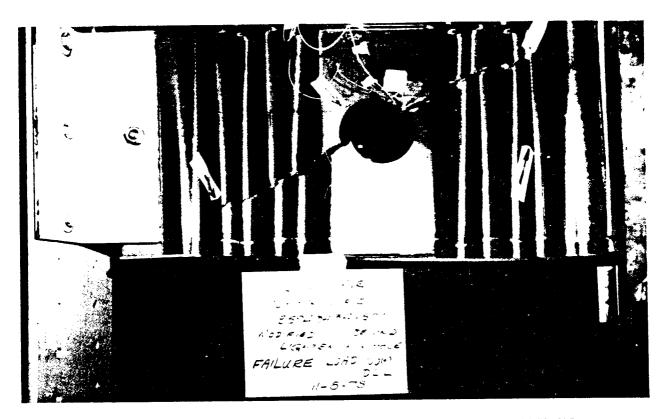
FAILURE OF SHEAR WEB AT UNFLANGED ACCESS OPENING
